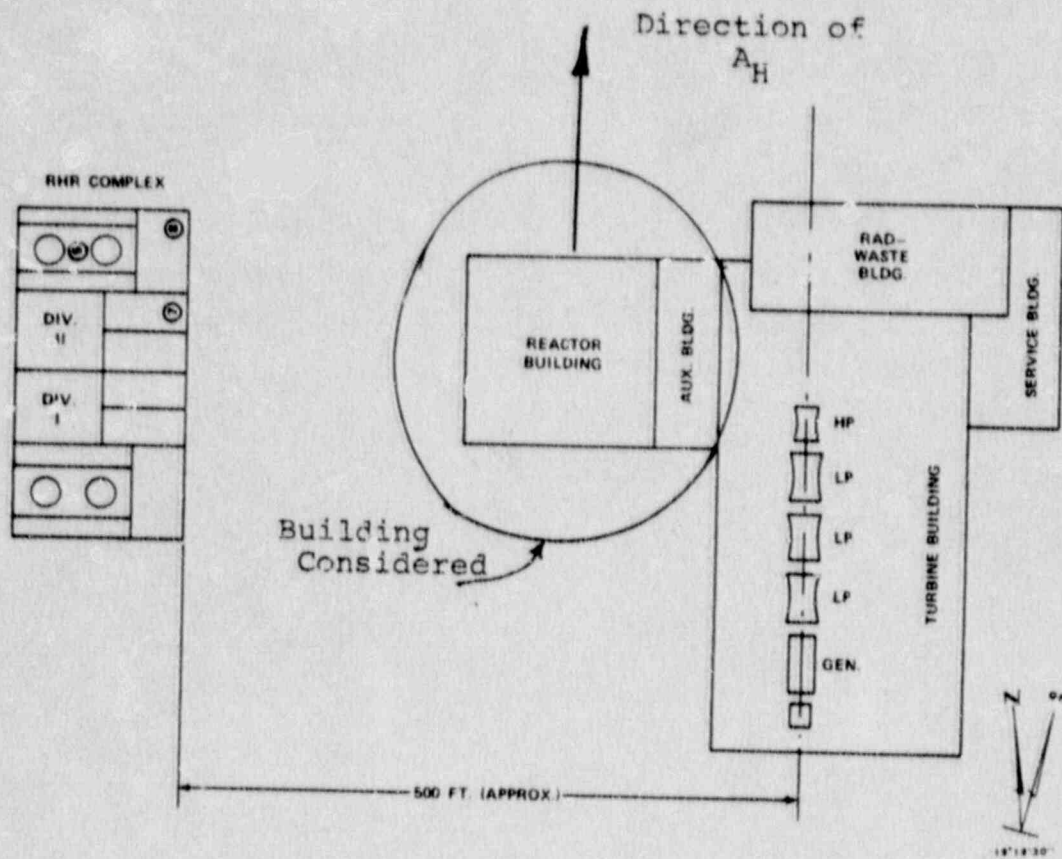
General Arrangement Plan of Major Structures at Fermi
